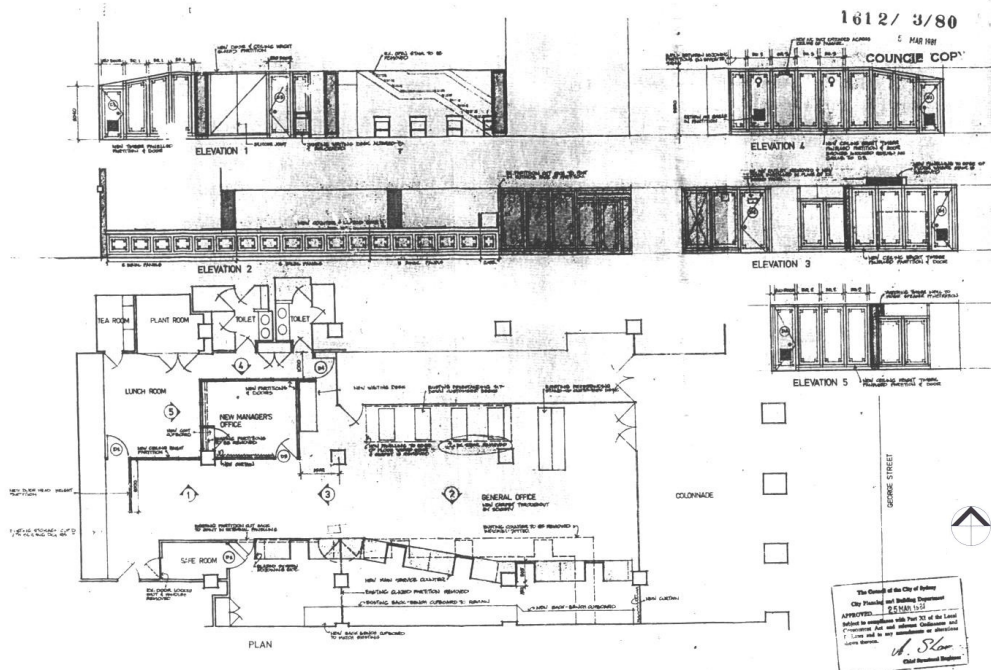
Office fitout at ground floor. Plan prepared for the NSW Building Society, August 1980 (Source: Sydney City Archives, BA1014/54)
